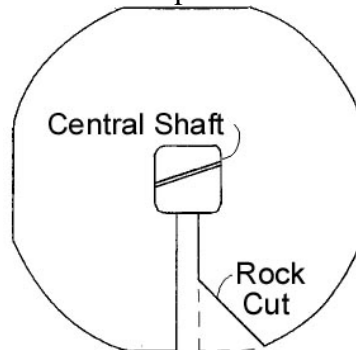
Shaft Cross Section, Rock Cut on Helix
